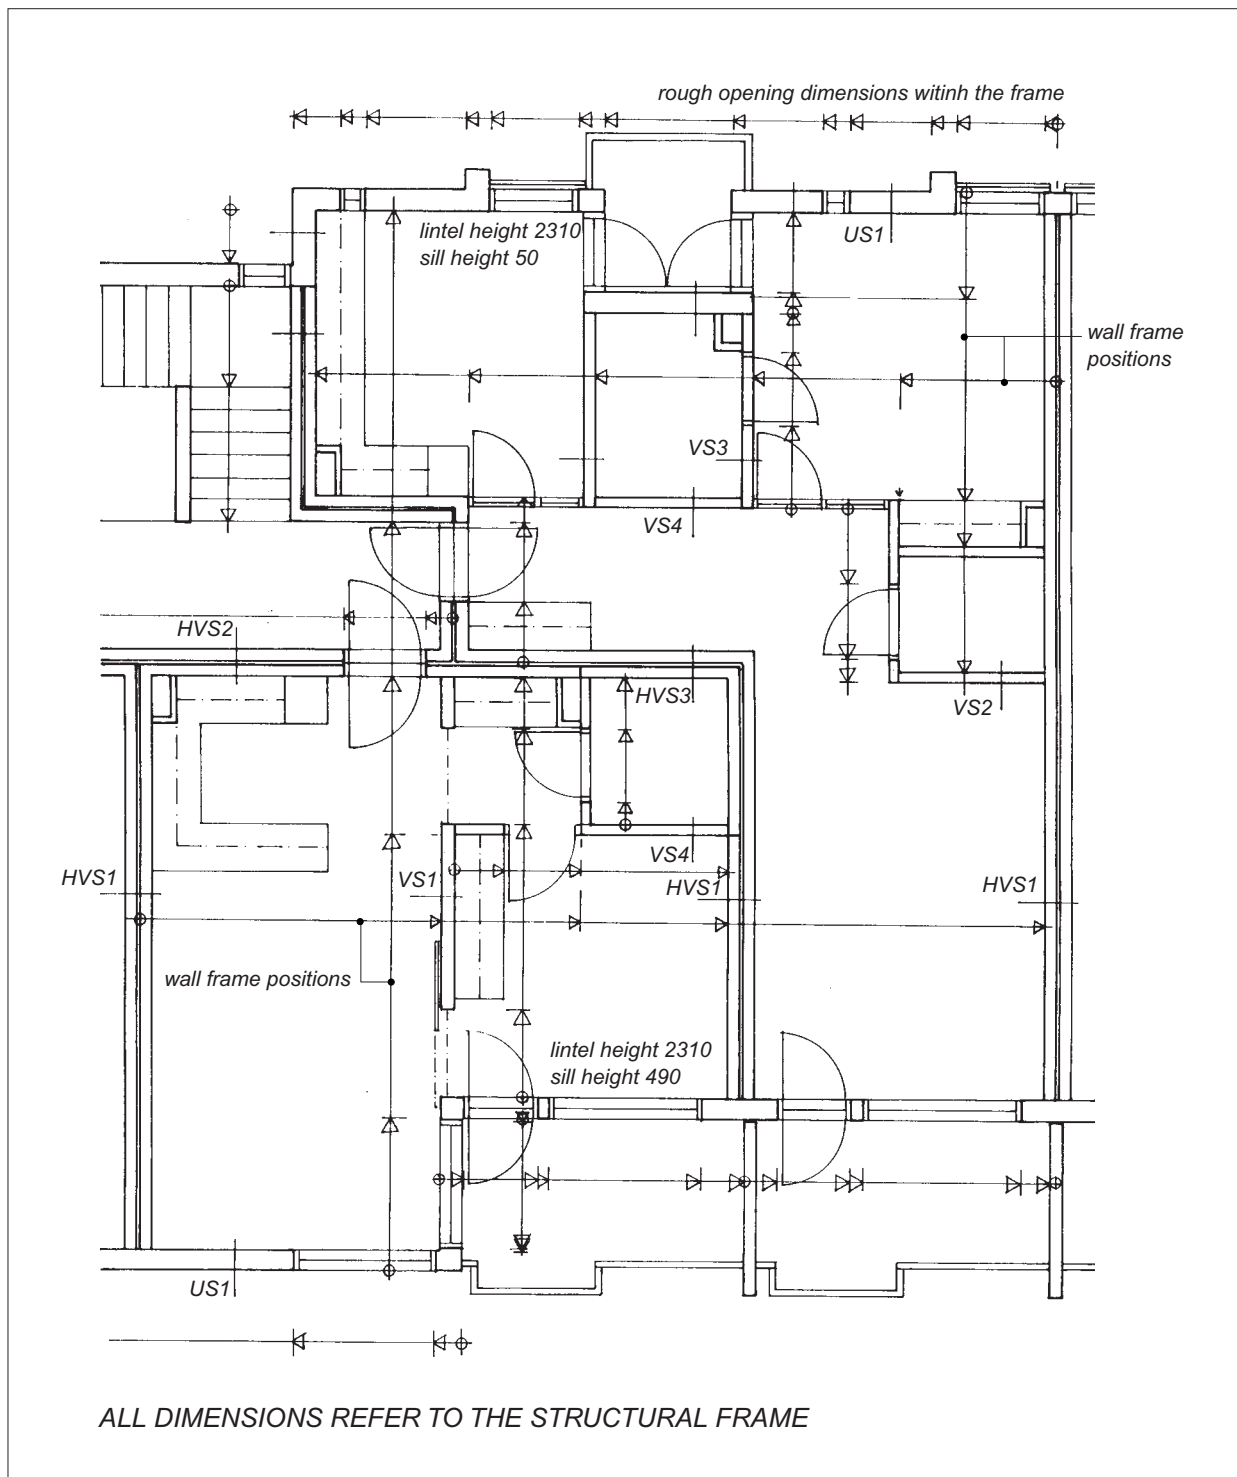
Plan showing structural dimensions. The positions of wall frames have been shown as a separate measurement from opening dimensions. In addition, the drawing also shows structural types and the lintel and sill heights of openings. NOTE: Structural dimensioning is not the same as a structural frame
